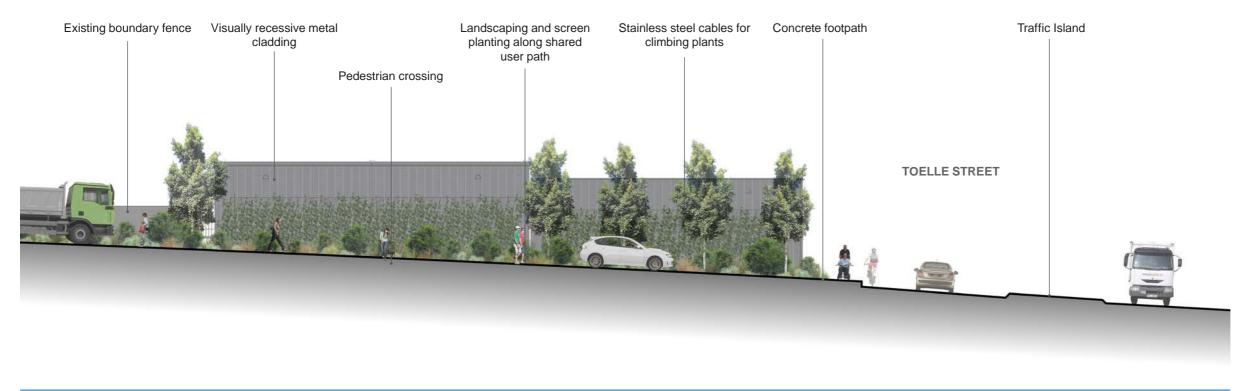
IICL Surface Fixed Facility - Elevation 2 subject to approval of modification SSI-7485-Mod-3
